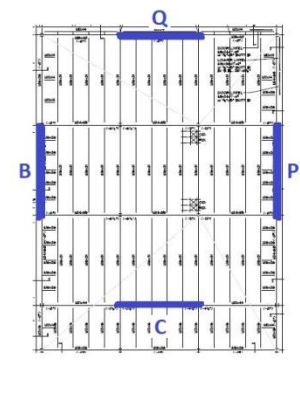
Braced Frame Layout in the Penthouse in the West Wing
